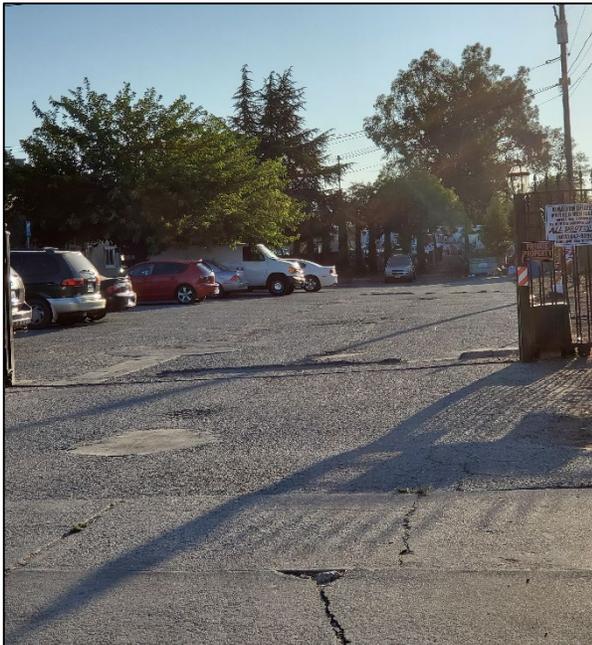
Residential development that sewer line will pass through prior to crossing US 101.
